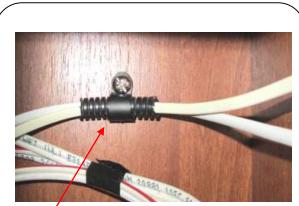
A Outgoing wires to switches secured behind cutout with P-clamp
